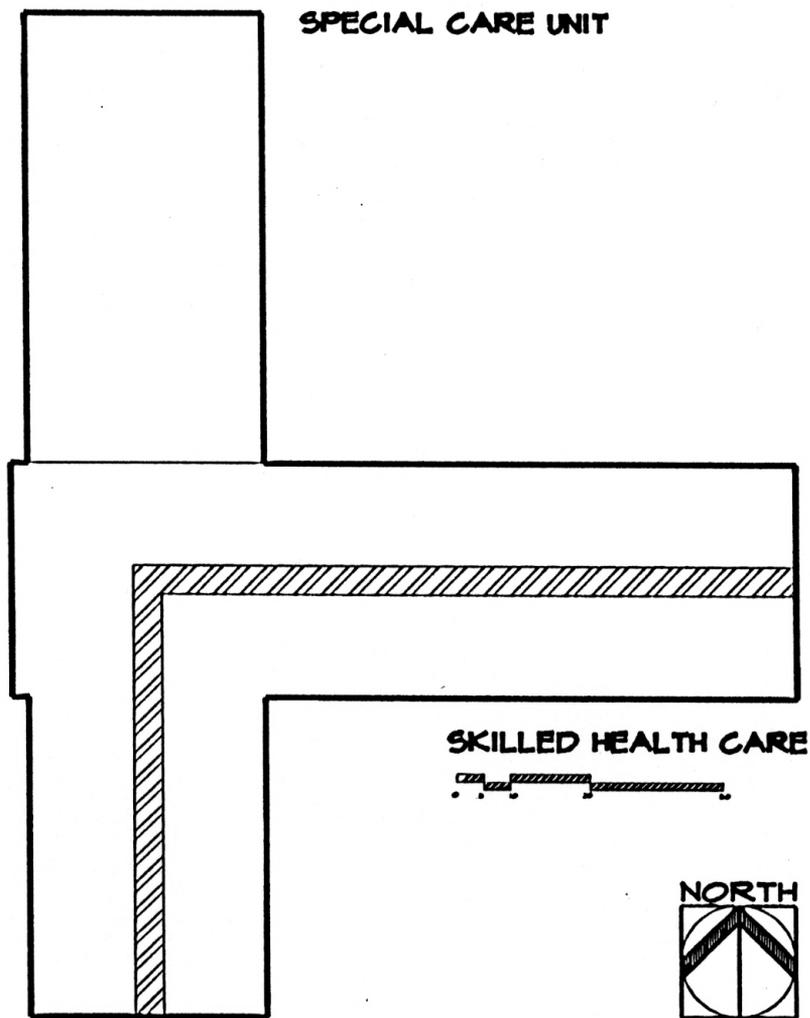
Plan of Skilled Care Hallways - Site 3.
